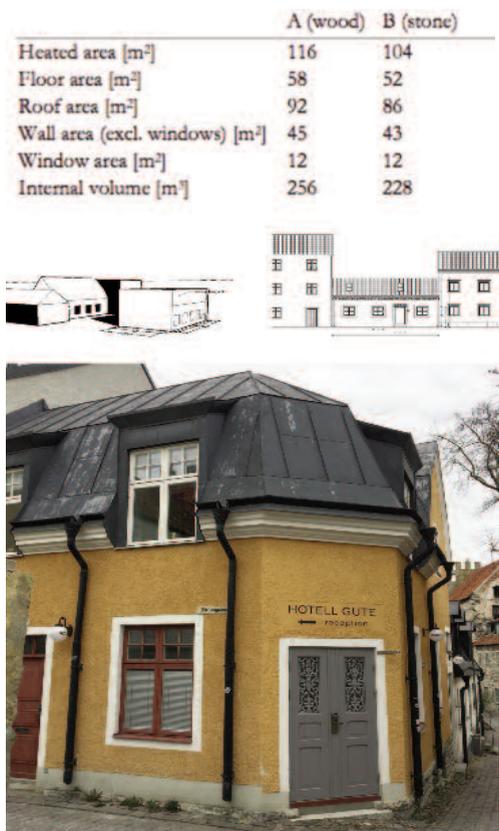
Typical building 3; its geometries and the medium sample building.
